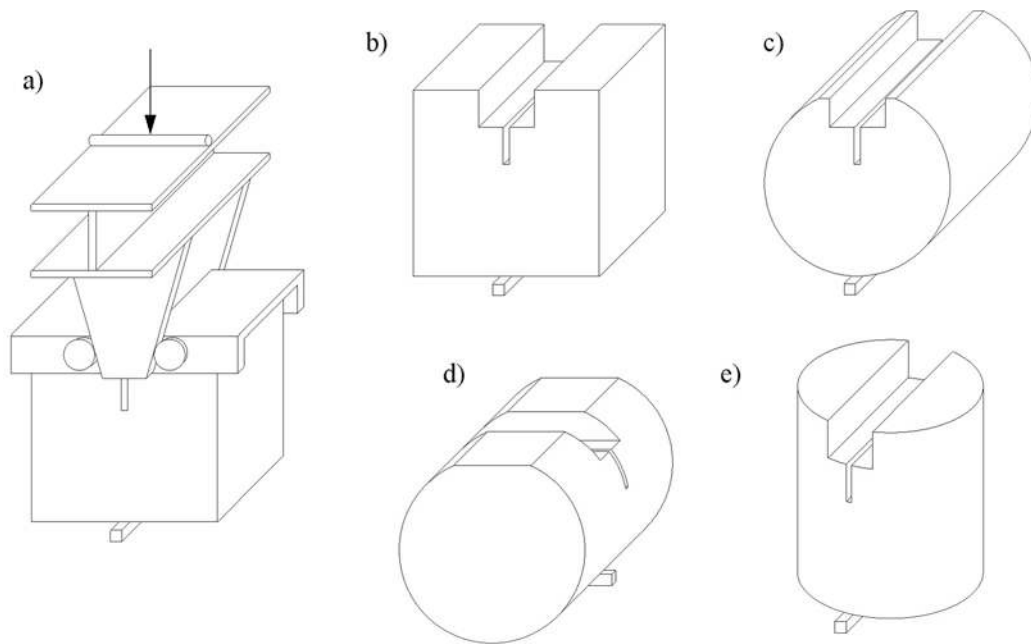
Wedge splitting test geometry: sketch of stiff fixtures transferring the load from the testing machine to the specimen (a), several variants of specimen shapes applicable for WST prepared from standard cube (b) and cast or core-drilled cylinder (c, d, e) (inspired by [24])
